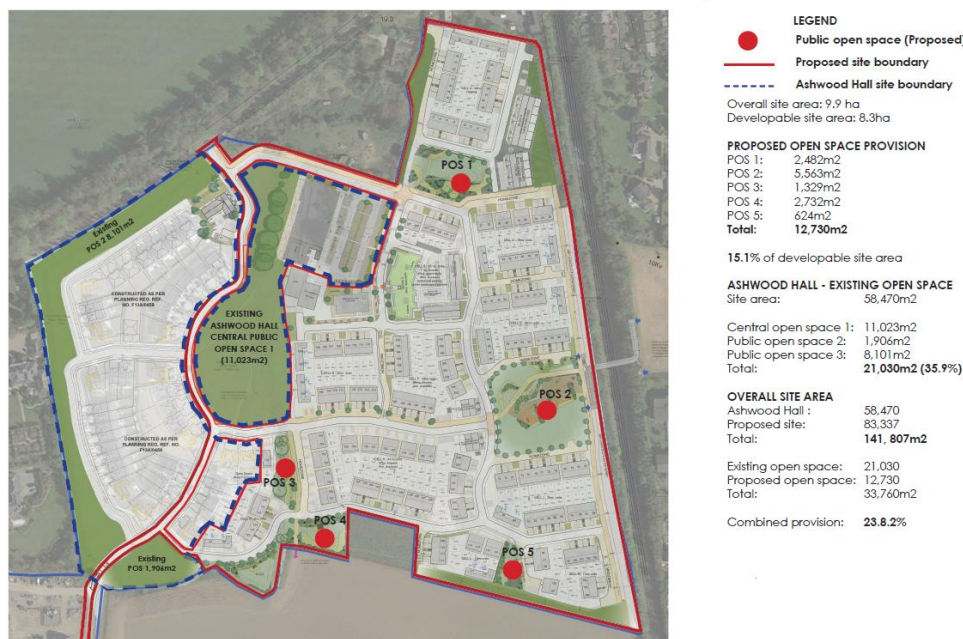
Masterplan Approach towards Public Open Space Provision at Back Road, Malahide (incl. the site subject to this planning application)
